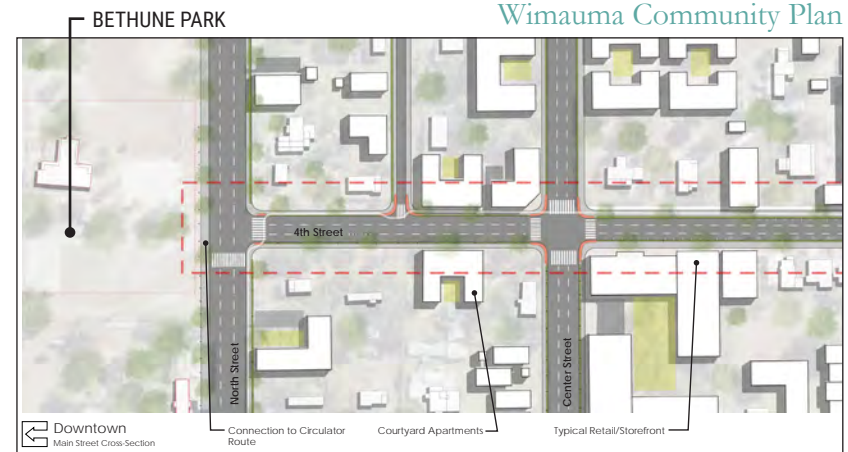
Proposed 4th Street (Main Street) Improvements from the Wimauma Community Plan
